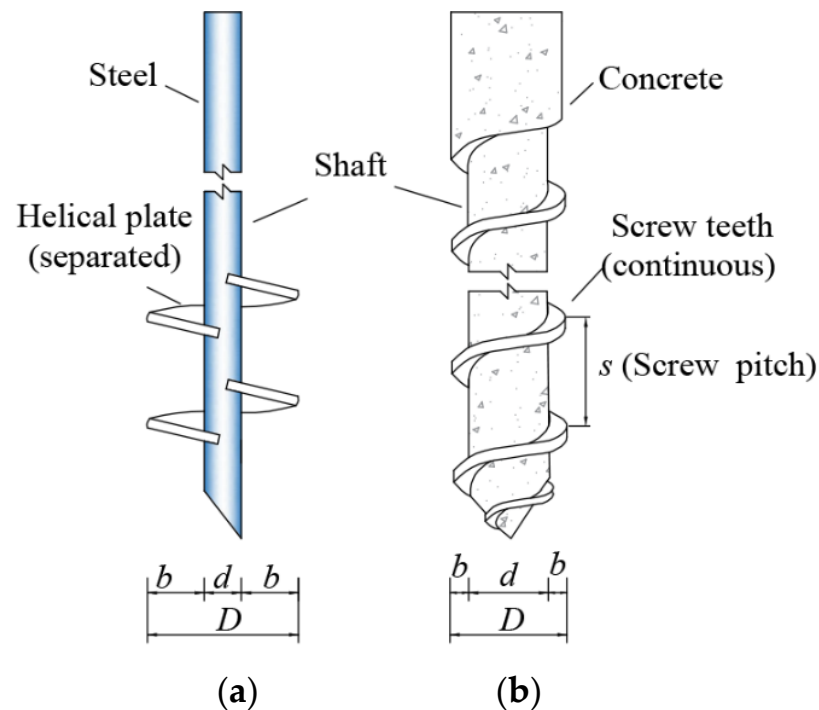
Schematic diagram. (a) Steel screw pile and (b) concrete screw pile.
